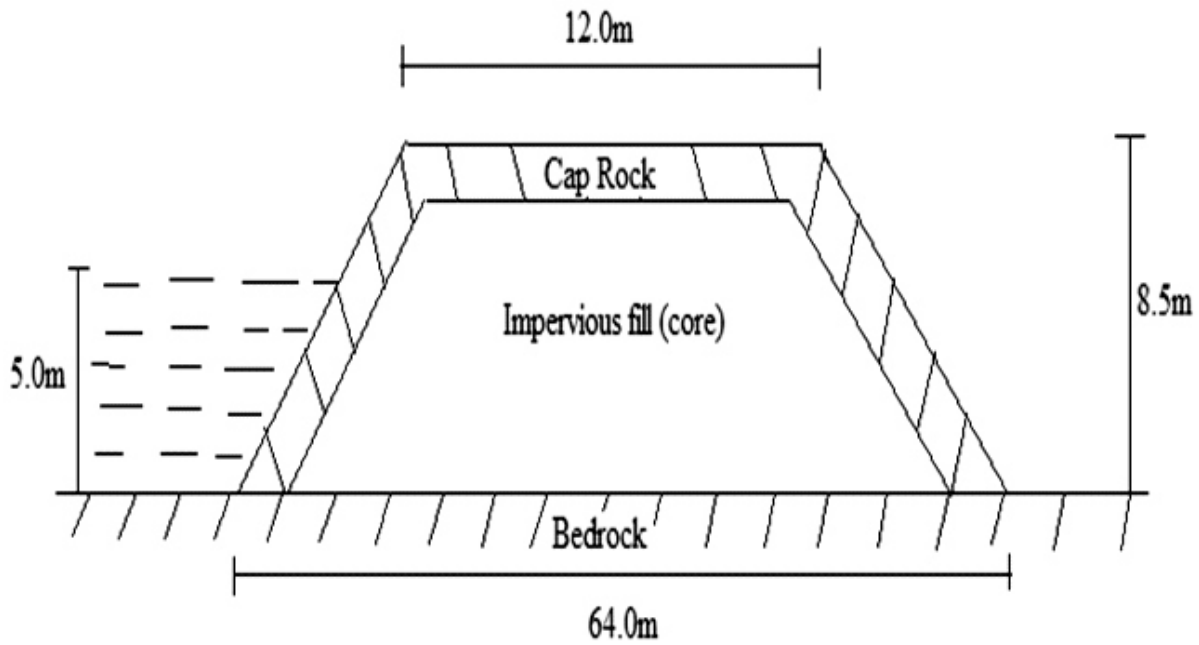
Awba Earth Dam Embankment Core Cross Section.
